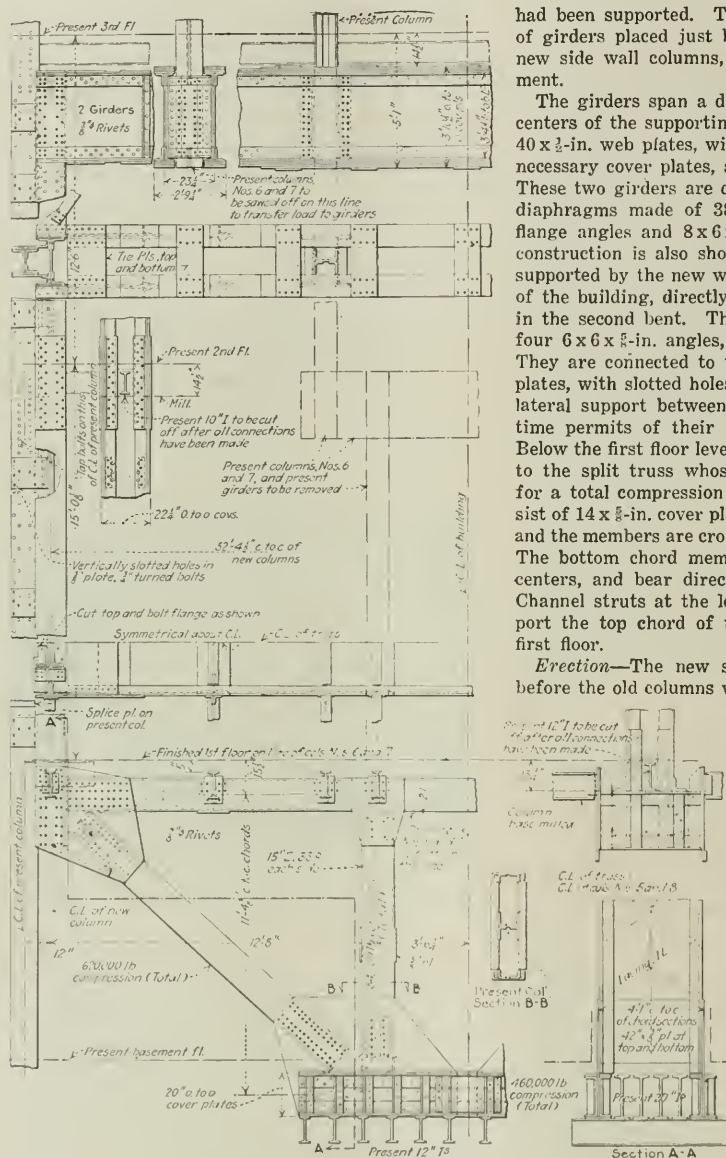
DETAILS OF THE COLUMNS, TRUSS AND GIRDERS
